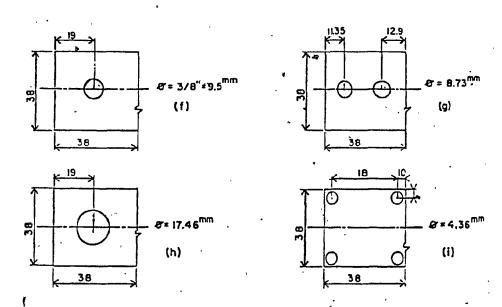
Joining Arrangement for Modern Building Material, continued.
